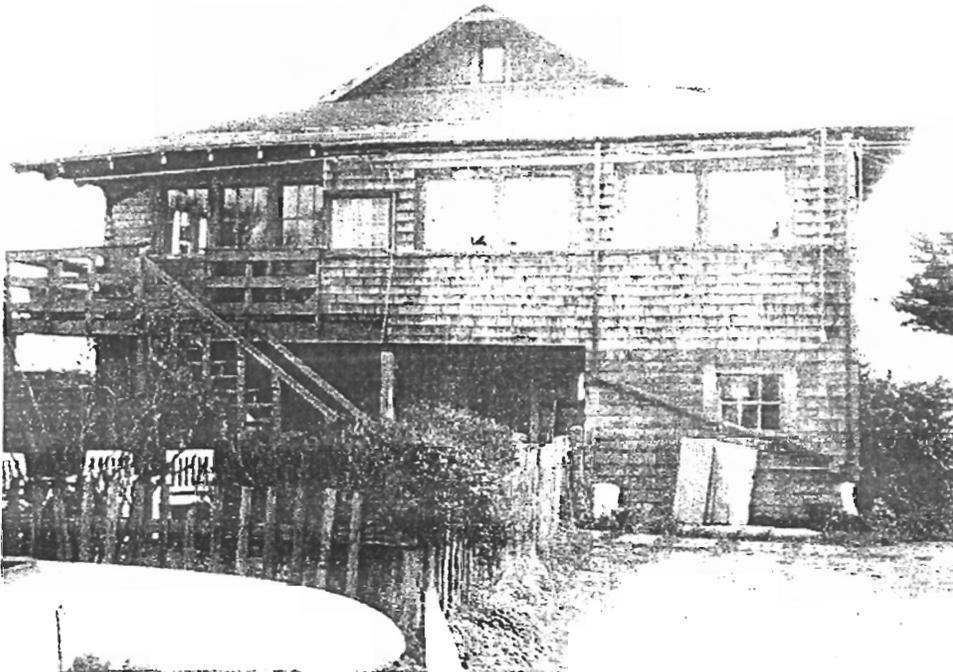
Back of the main house with the back addition occupying most of the photo. Note the downward bow of the eave at the left dormer. Note also the severe sag in a hip at a dormer that is barely visible over the right roof.
